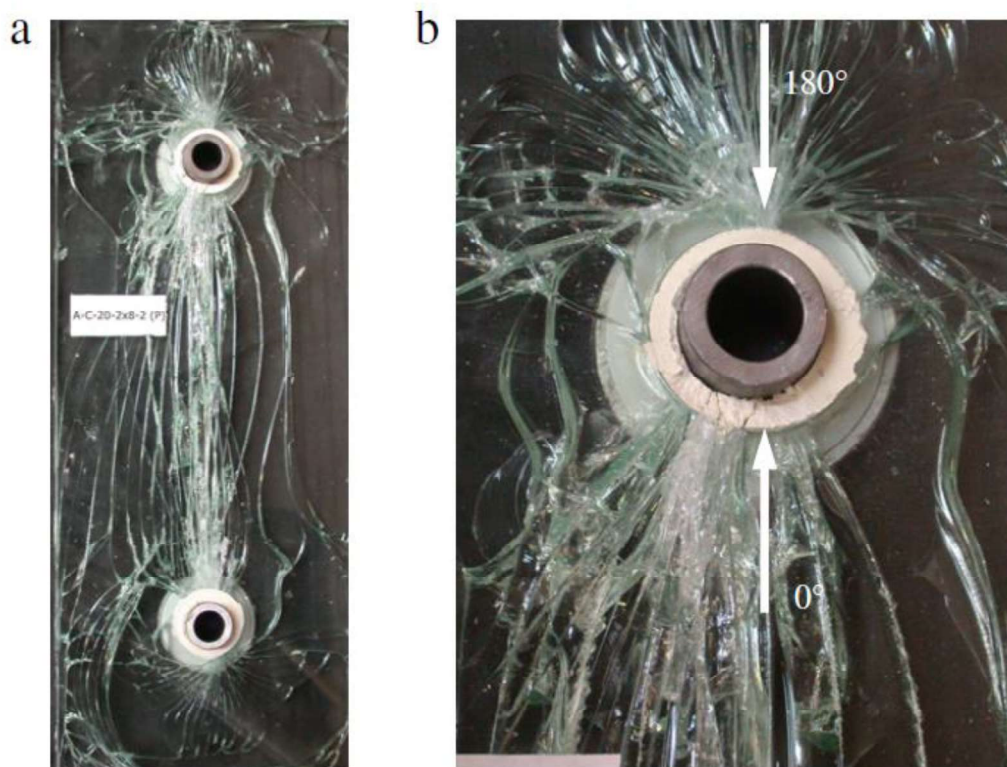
Experimental splitting tension crack pattern: (a) final crack pattern; (b) detail of crack initiation at the borehole [4]
